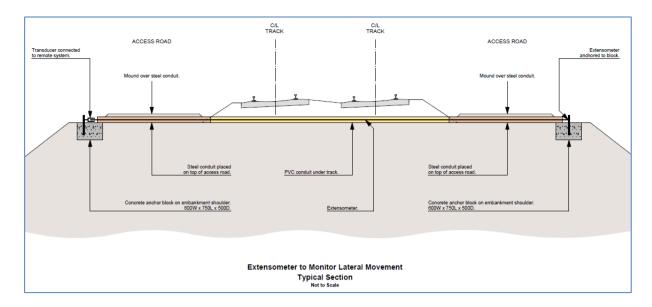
Details of extensometers installed across the crest of the RBCC embankment
